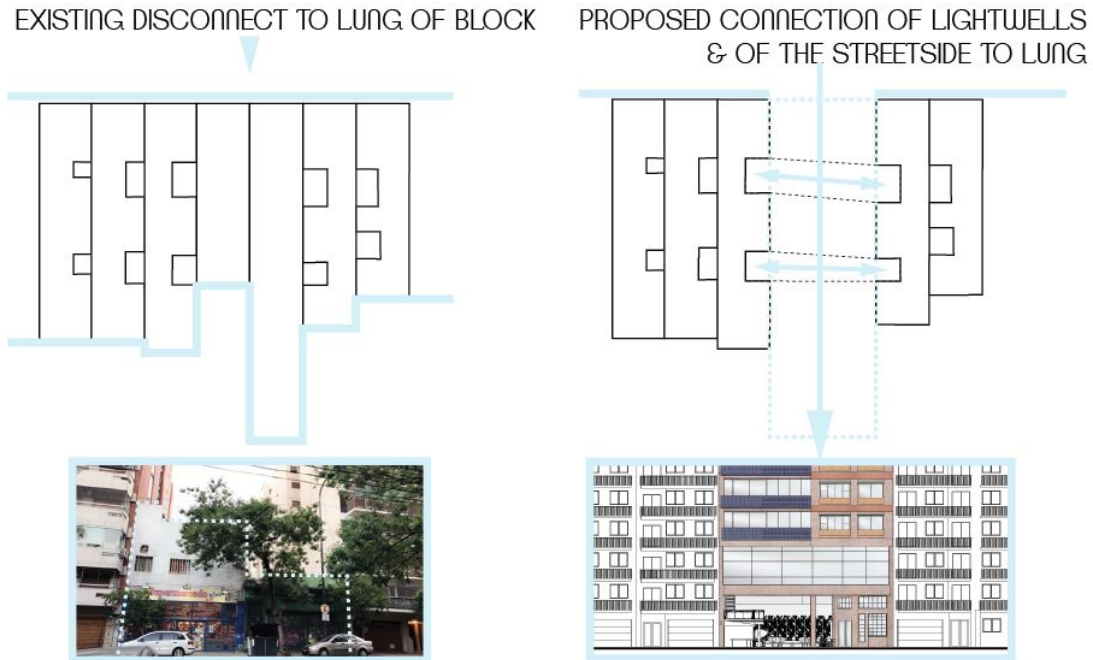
Existing versus Proposed Connections to Lung of Block (Author)
